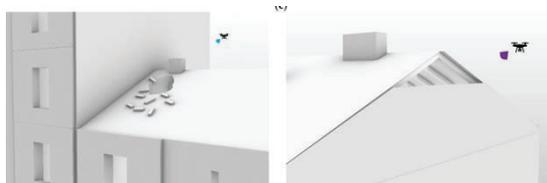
Possible damage on the roof level of a building after an earthquake [16]
